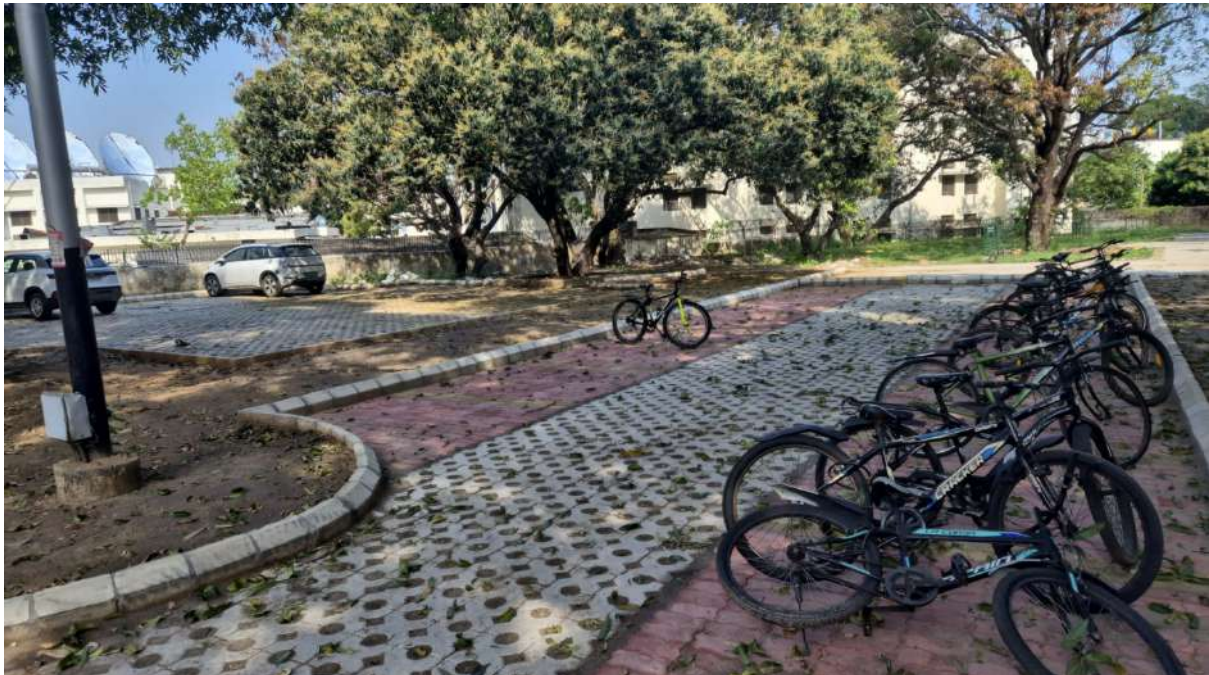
New Parking Lot with grass pavers and no concretisation and open spaces (Geospatial Building, Department of Civil Engineering)
